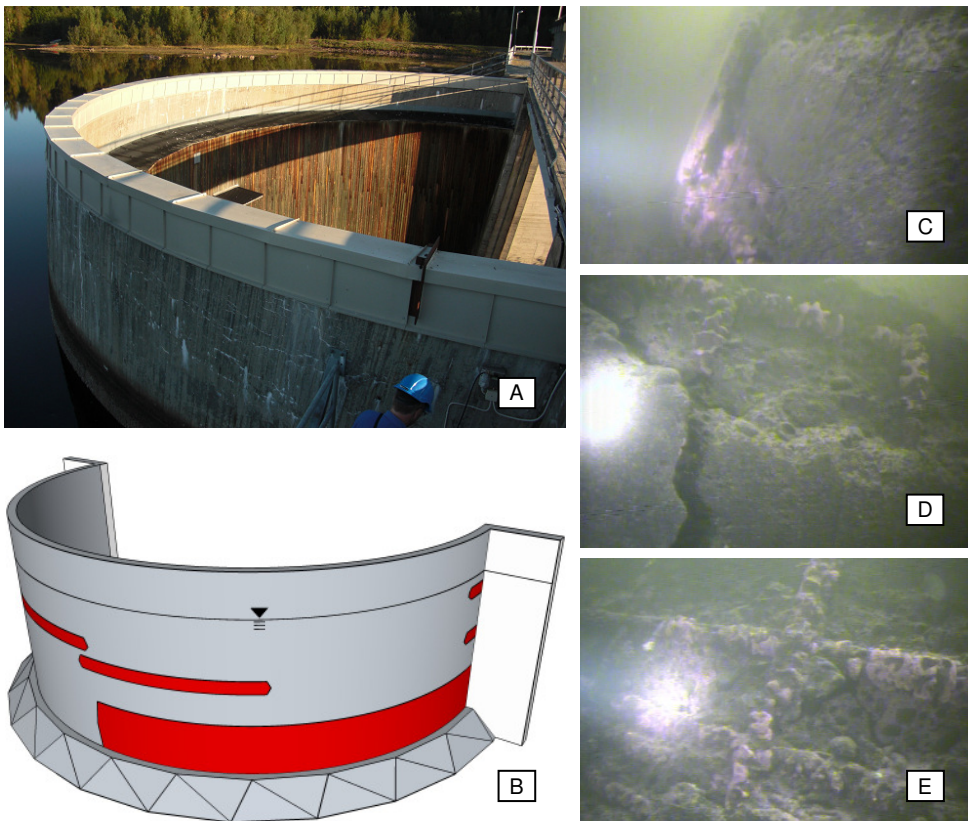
The greater part of the damage to the arch dam at Selsfors (A) was found on the lower part of the dam (B). Photos of corroding steel reinforcing bars and loose pieces of concrete on the upstream face (C-E). Photos from Skellefteå Kraft AB.
